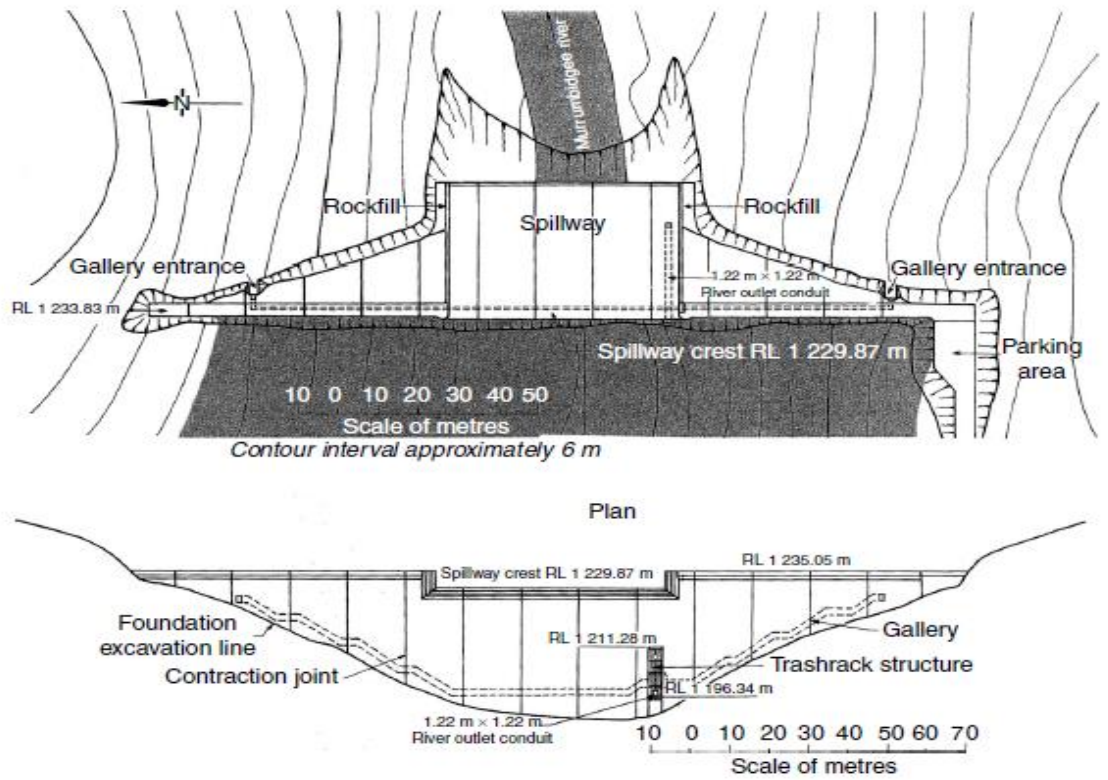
1: Typical concrete gravity dam plan and elevation (Fell et al., 2014)
